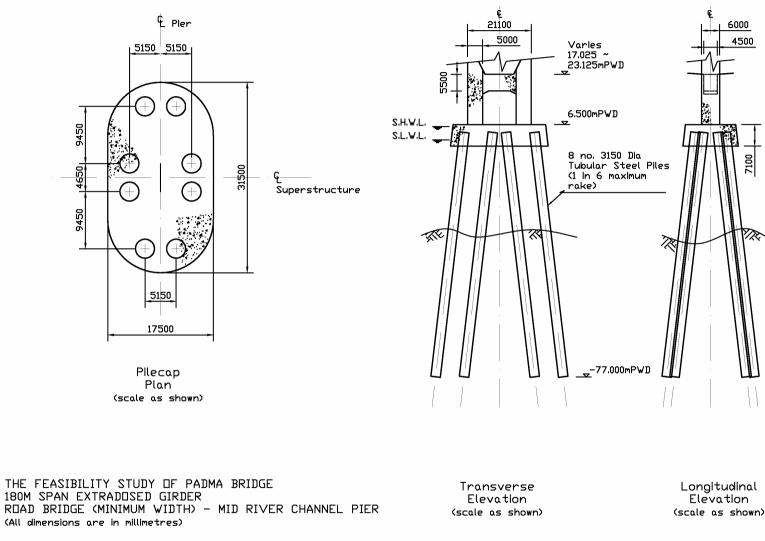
Mid-River Substructure General Arrangement (Alternative-H3)
